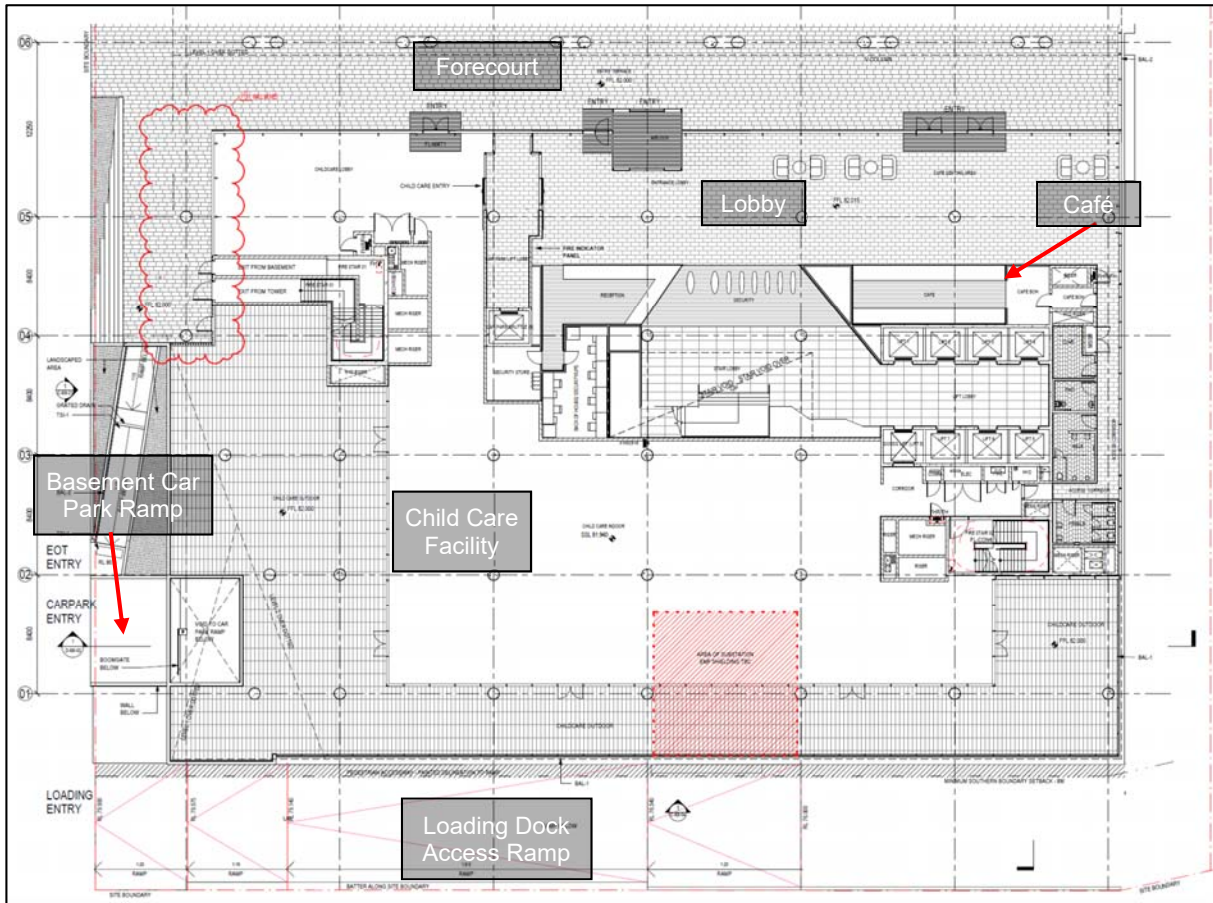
Proposed Ground Level Plan (source: RtS – BVN Architects)
